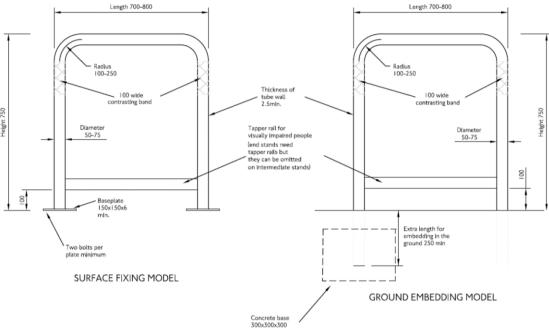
Typical Detail of a 'Sheffield' Cycle Stand
